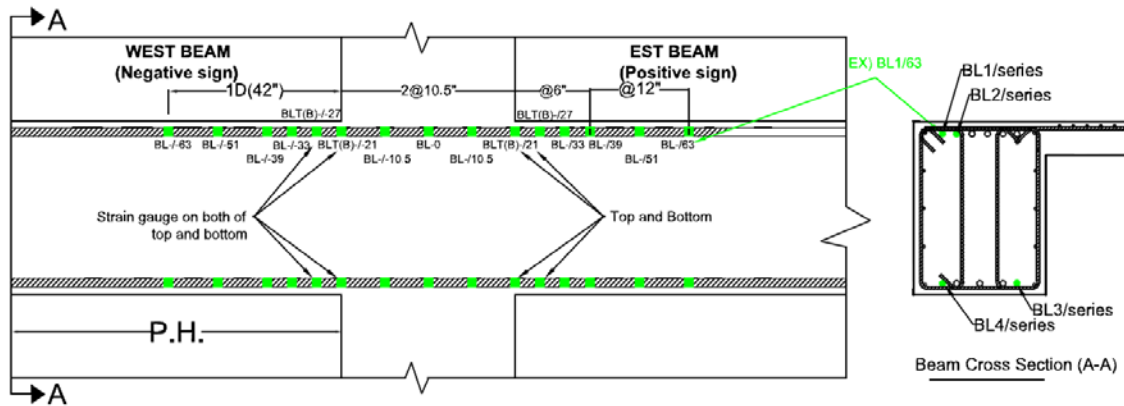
Locations of strain gauges on beam longitudinal reinforcement
